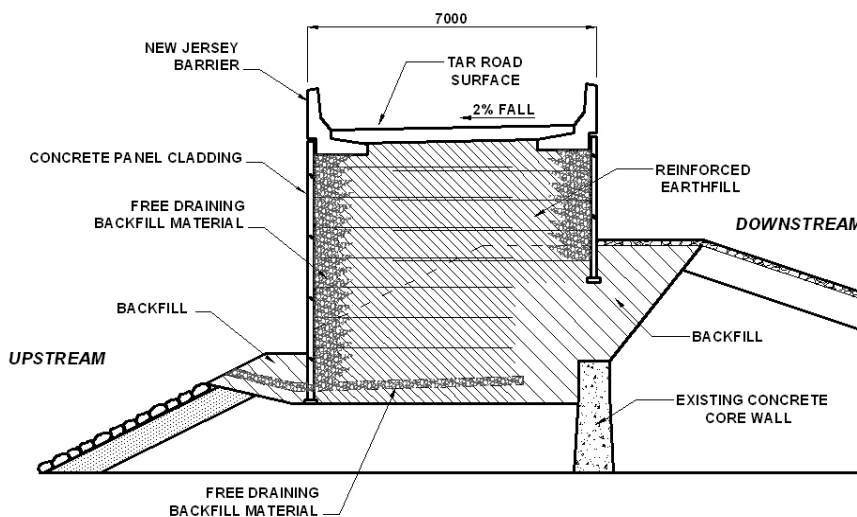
Rietvlei Dam: Typical Detail of MSE Crest
